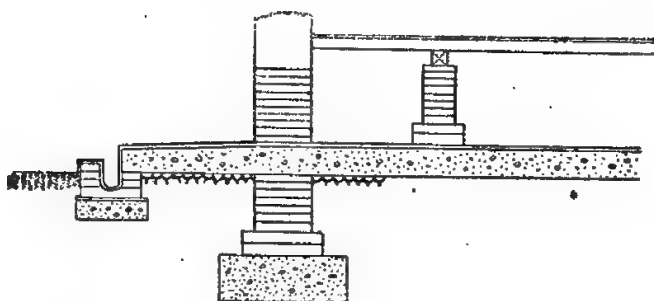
Detail of termite-proof construction; a continuous layer of cement at ground level.
